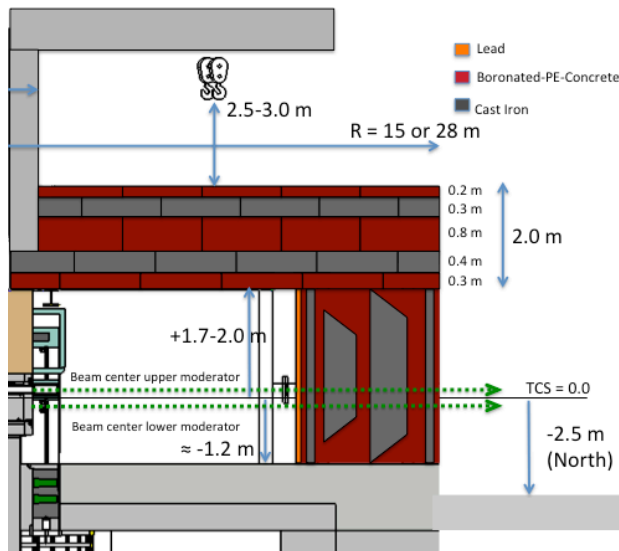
The schematic shows the side view of the bunker wall and the roof.
